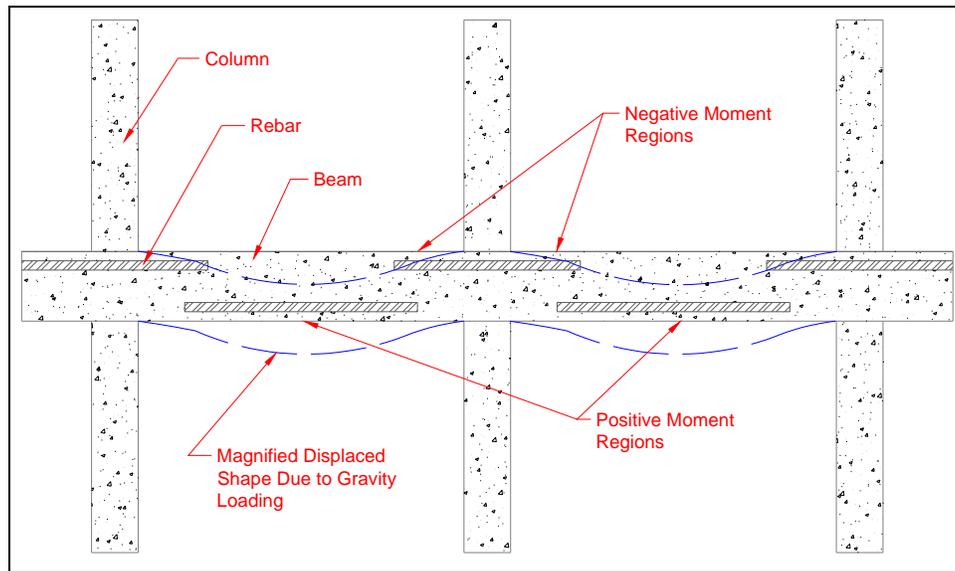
Typical reinforced concrete beam design for normal gravity loading.
